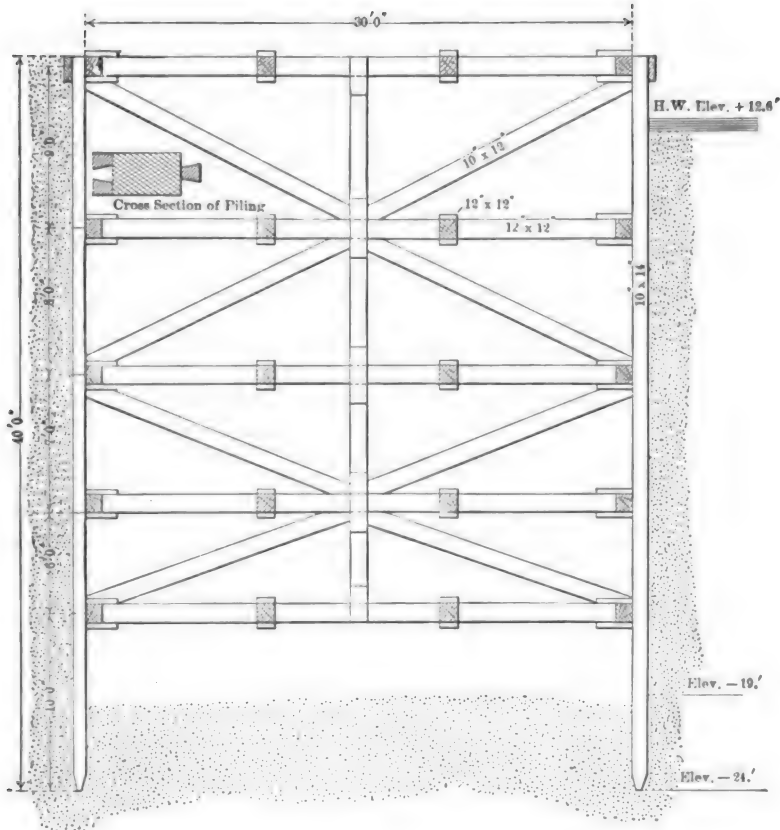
SALMON BAY COPPER-DAM PIER NO. 3.
